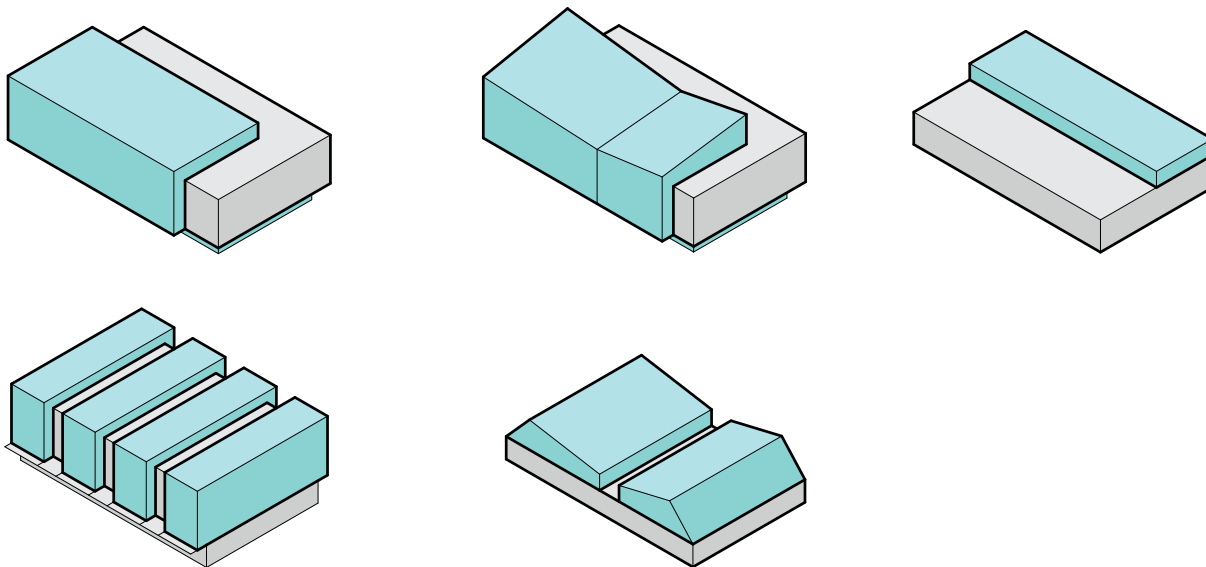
Illustrative Roof Massing and Articulation. Roof projections can modulate the roof line, tie the building together horizontally, and emphasize building corners. Should be combined with facade articulation.
